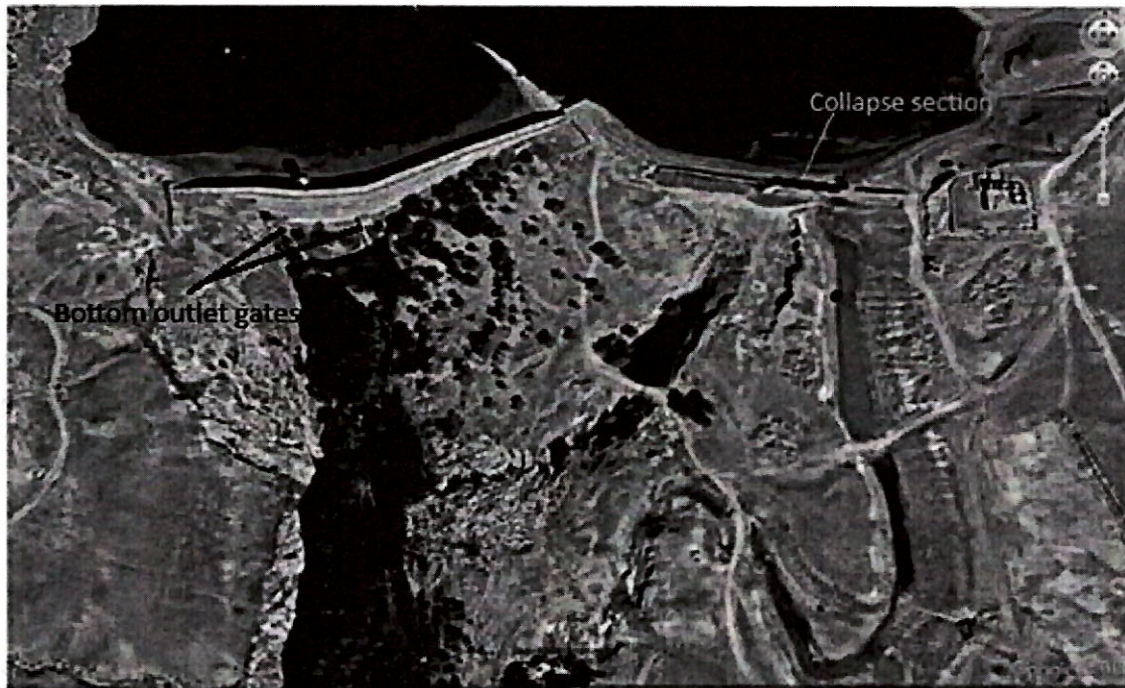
Sultan main dam (on the left) its 200 m long saddle with a long-eroded ditch, and collapsed section of 55 m (Image taken Sep-2022). Only 162 m long section of this will be constructed of Earthfill.
